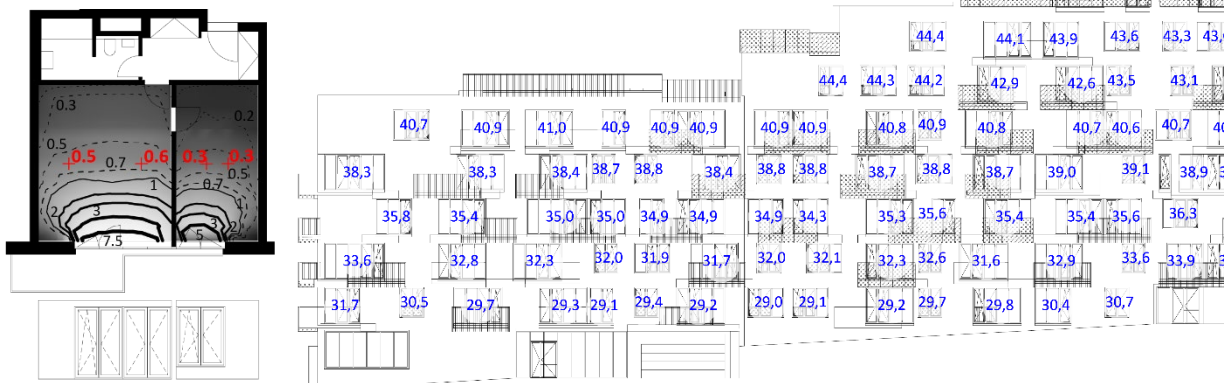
Residential Block 4BLOK daylight factor [%] levels in typical 1<sup>st</sup> floor apartment (1:250) and on east facade (1:500) (source: author)
